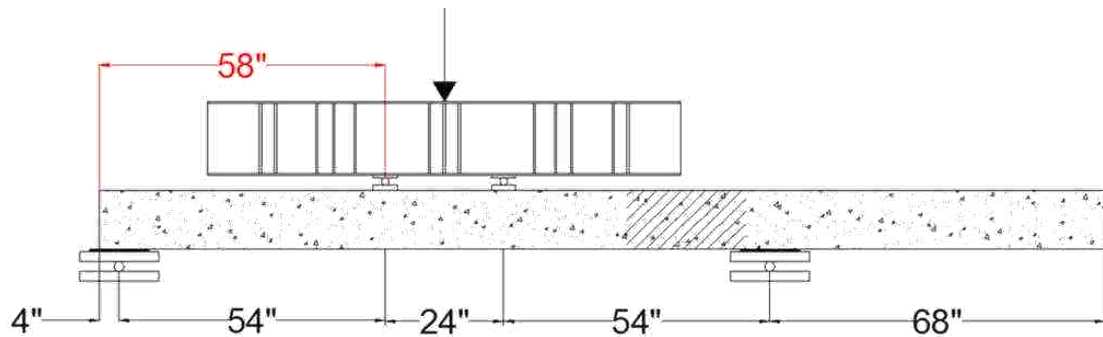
58 in. (1,473 mm) Embedment Length Test Setup
